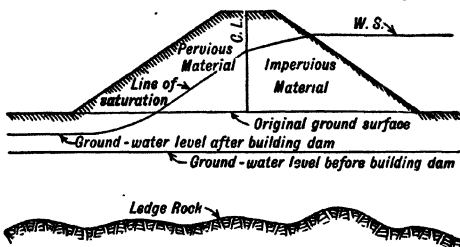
Earth Dam with Pervious Downstream Section and Impervious Upstream Section.
